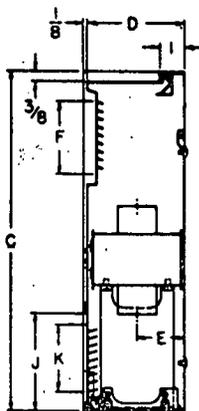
DETAIL OF DAMPER MOUNTING — ALL UNITS (TYPE W SHOWN)
